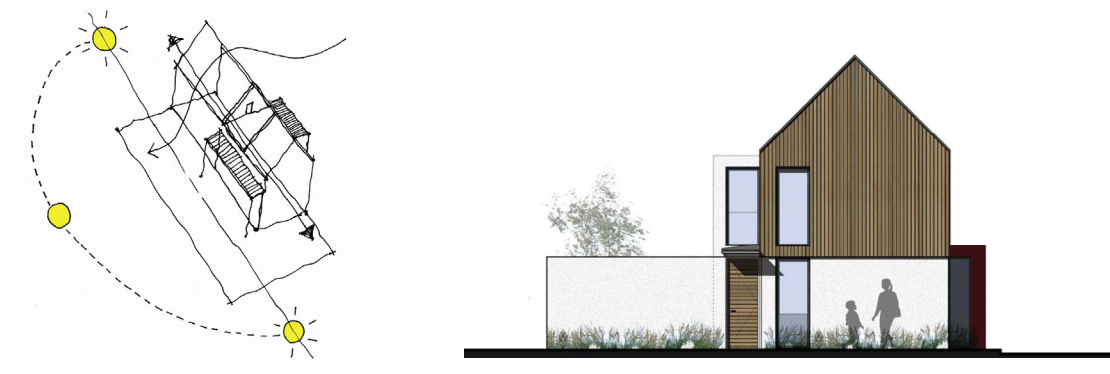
Concept of Ty Unnos longhouse showing main aspect facing south; Fig. 4.39 East elevation
